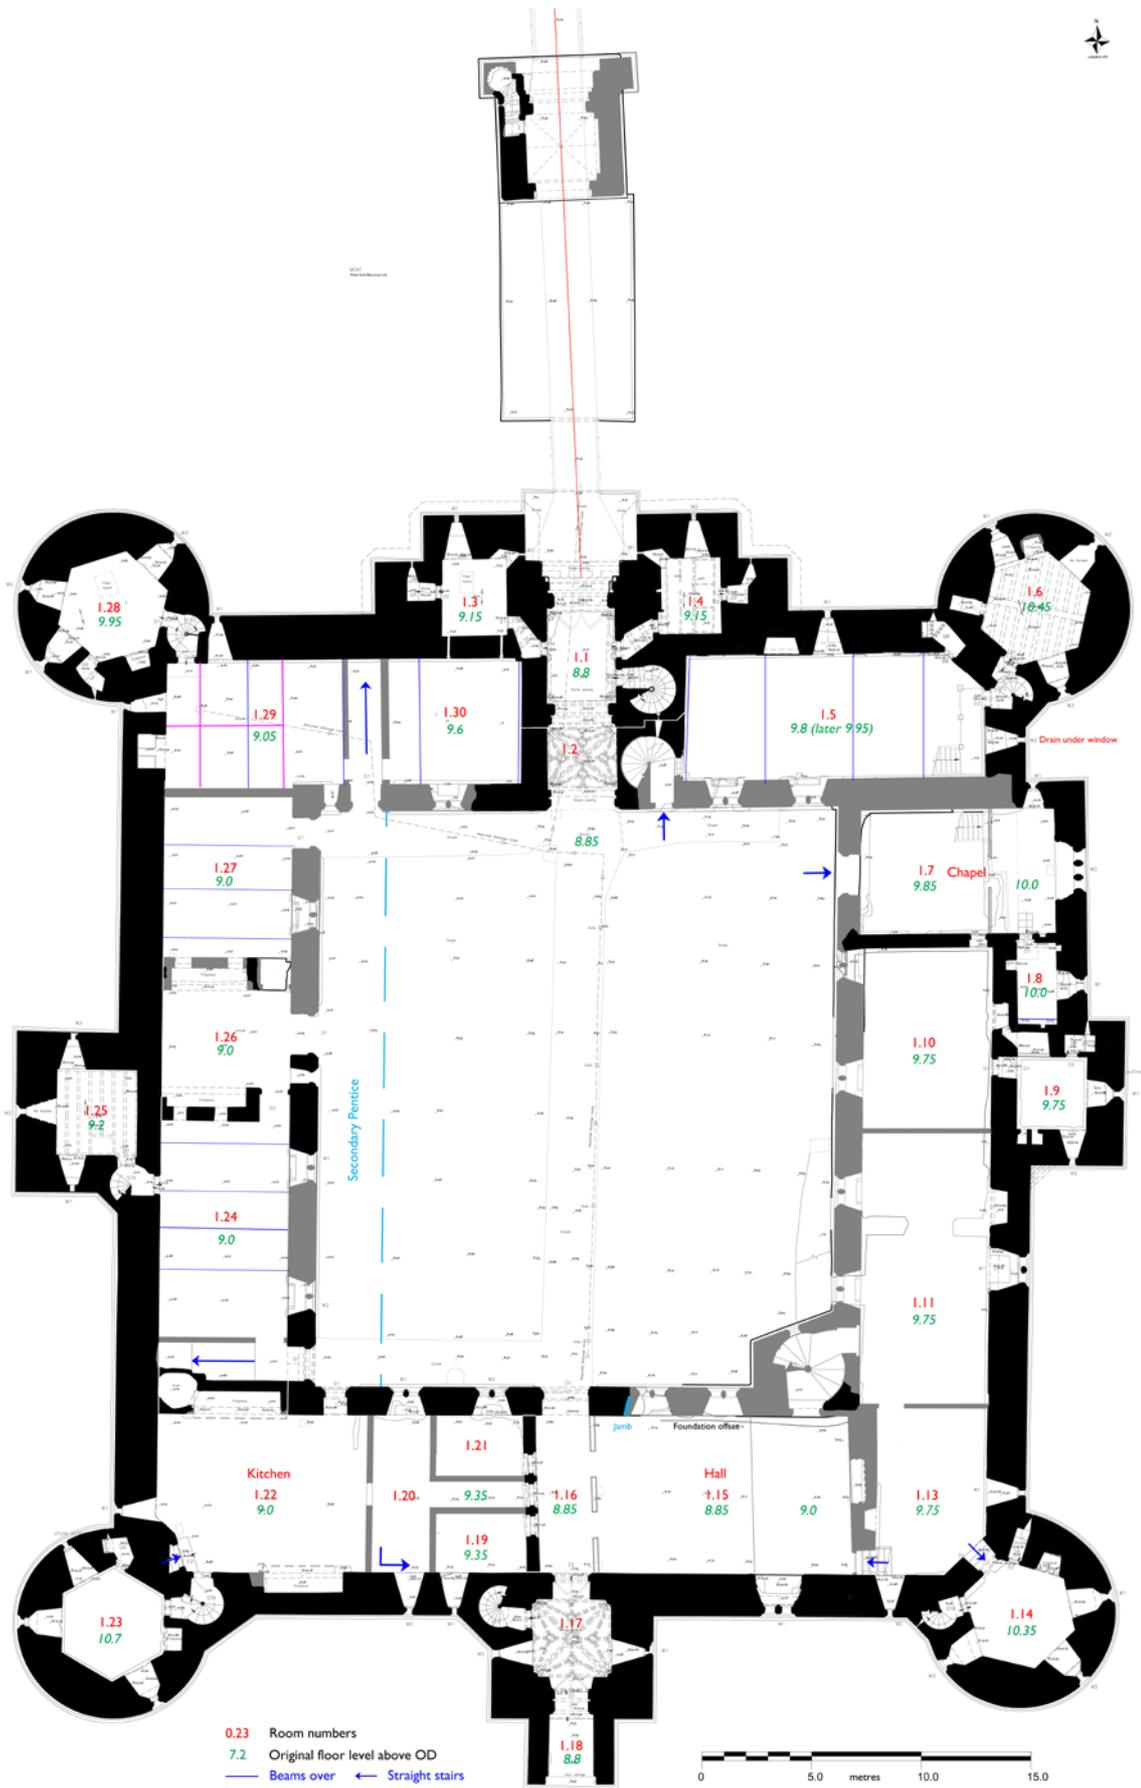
Bodiam Castle Ground Floor Plan (based on a survey by James Brennan Associates); reconstructed lines and walls in grey tone
